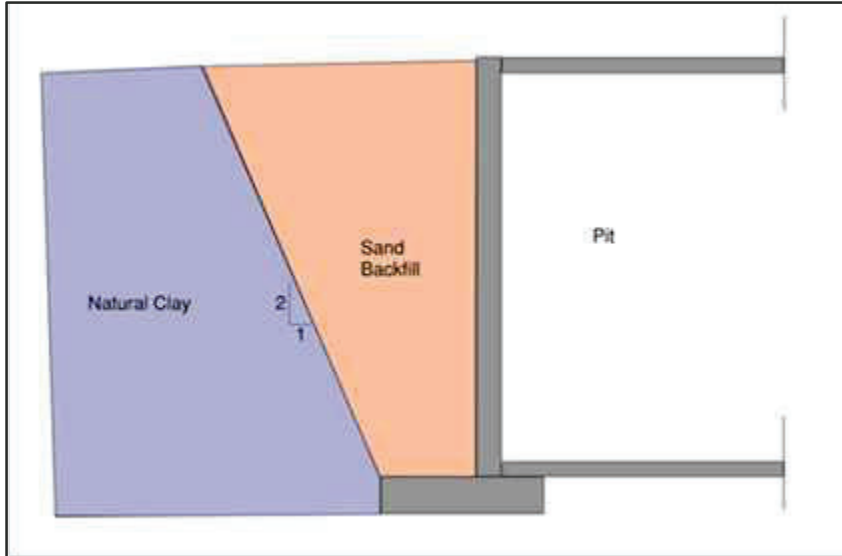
Zone Of Granular Backfill For Pit Excavations
